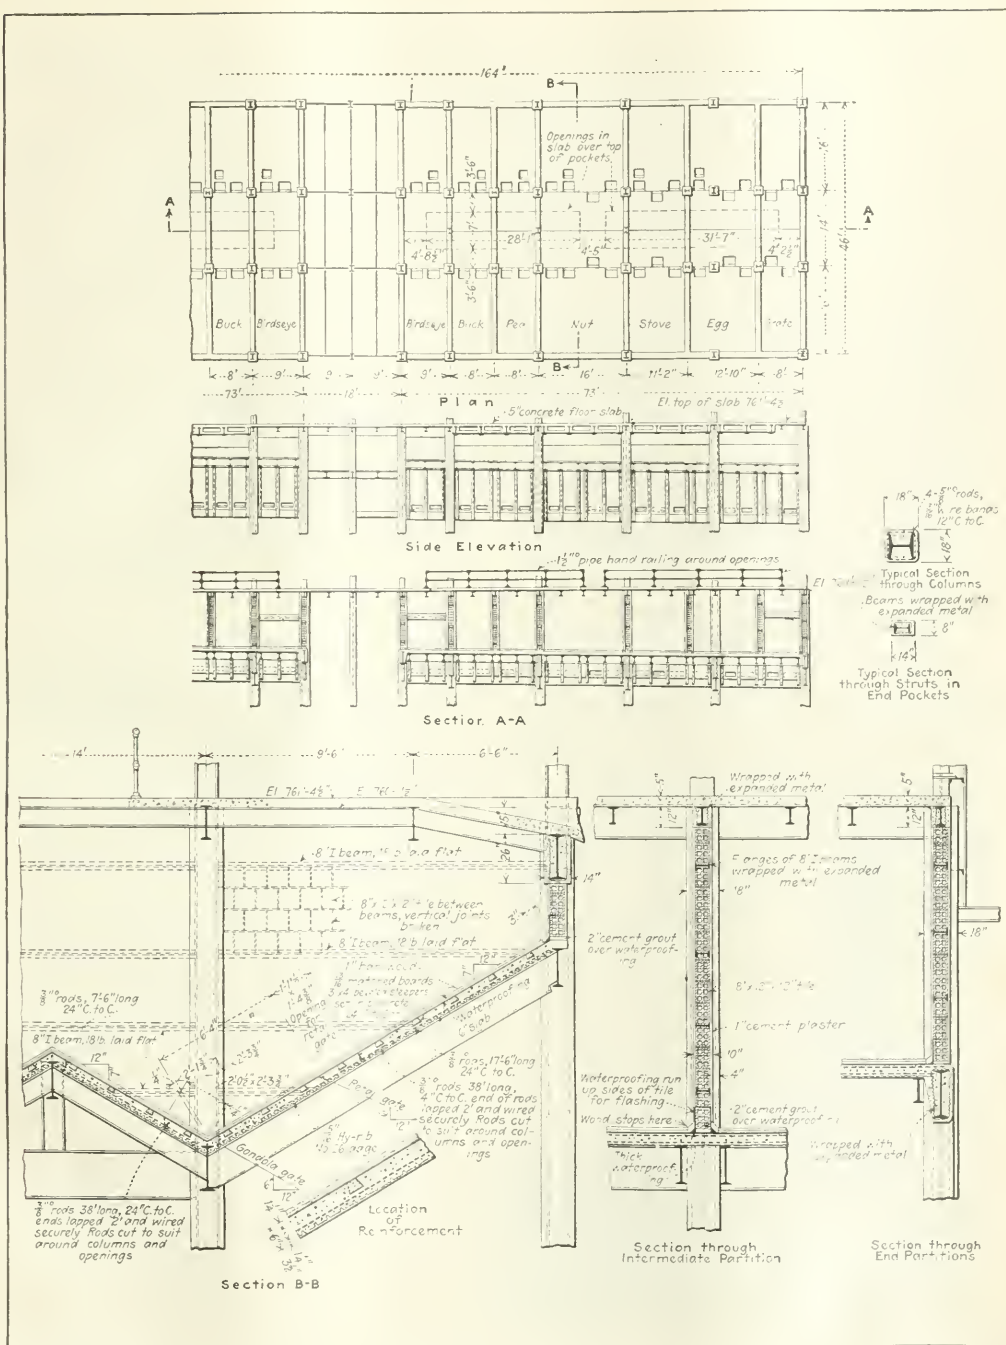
SECTION THROUGH POCKETS OF MARVINE BREAKER SHOWING FIRE-PROOFING METHODS. All the loading pockets are built on steel stringers framed into the steel-work of the breaker. Their floors, side walls and partitions are of reinforced concrete, but hollow tile has been used between the pockets, which are waterproofed with a coating of asphalt mastic on the inner side. The wood lining which is necessary to protect the pocket floors and side walls from abrasion by the coal and the effects of acid water is set in the mastic.
